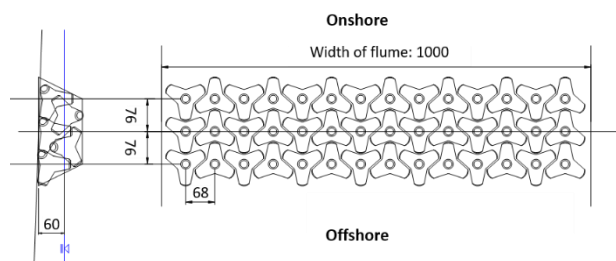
Layout of the two-layer breakwater (unit in mm).
